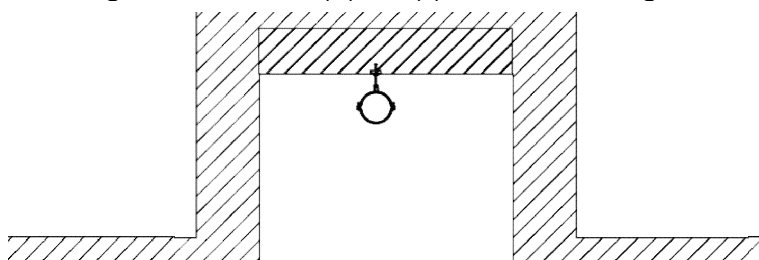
Fig H. Typical Arrangement for PIPE and drain pipe support from building shaft
